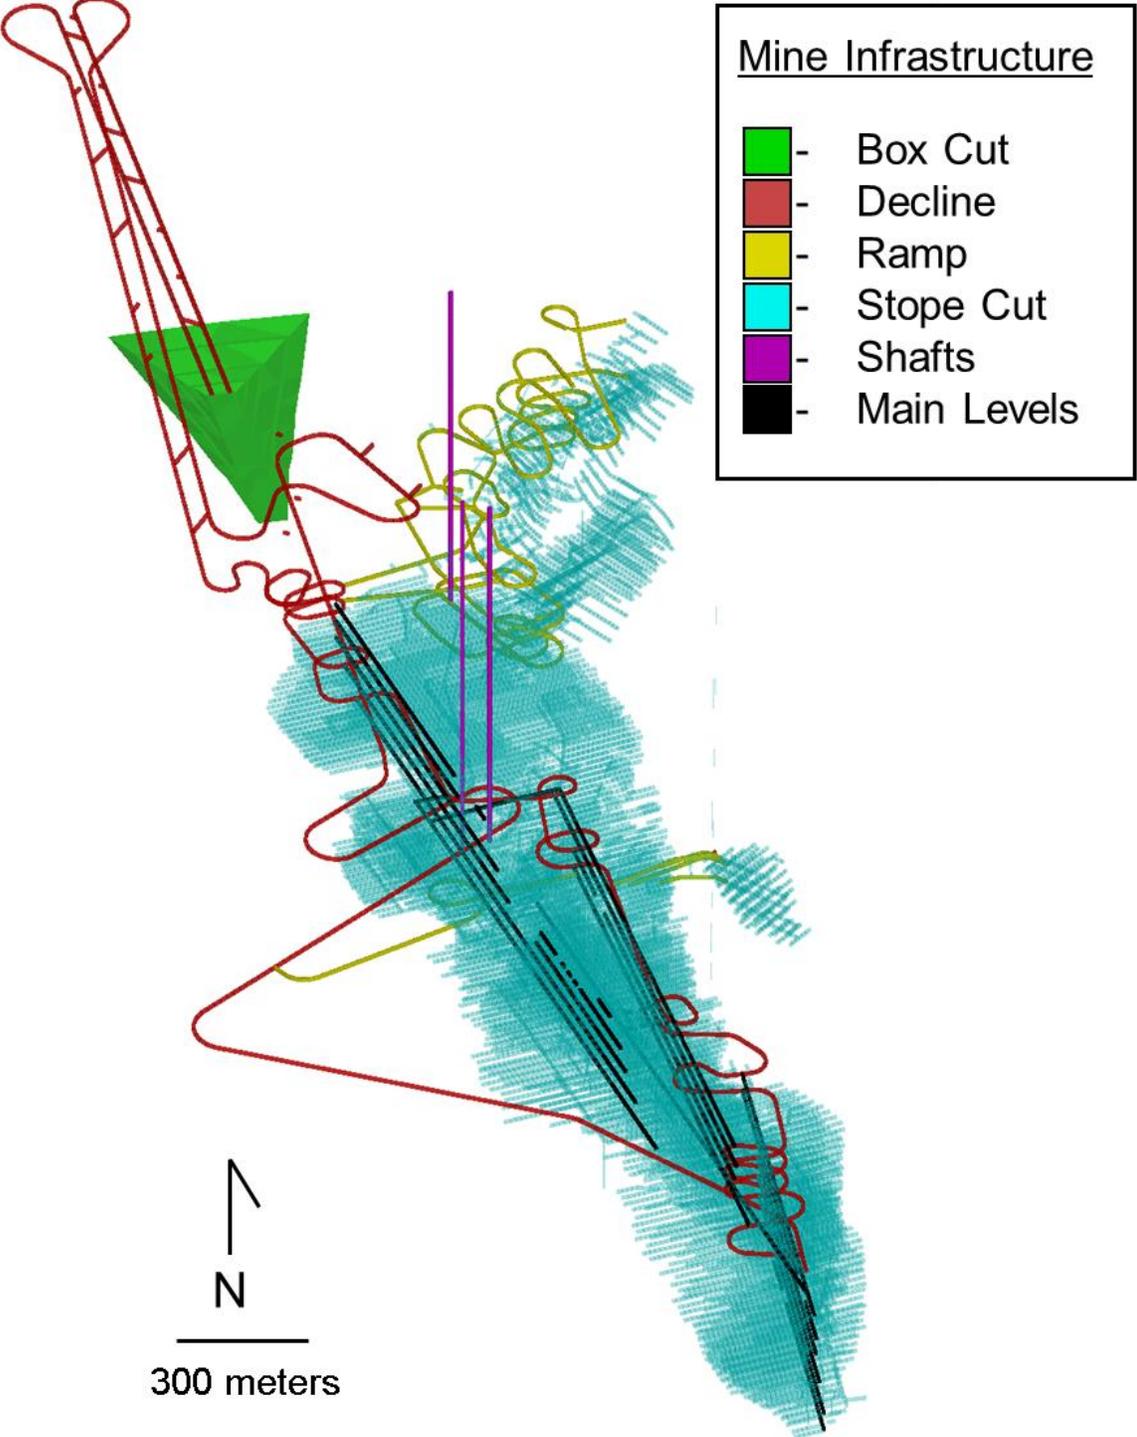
Santa Cruz Copper Project underground mine design, long-section
